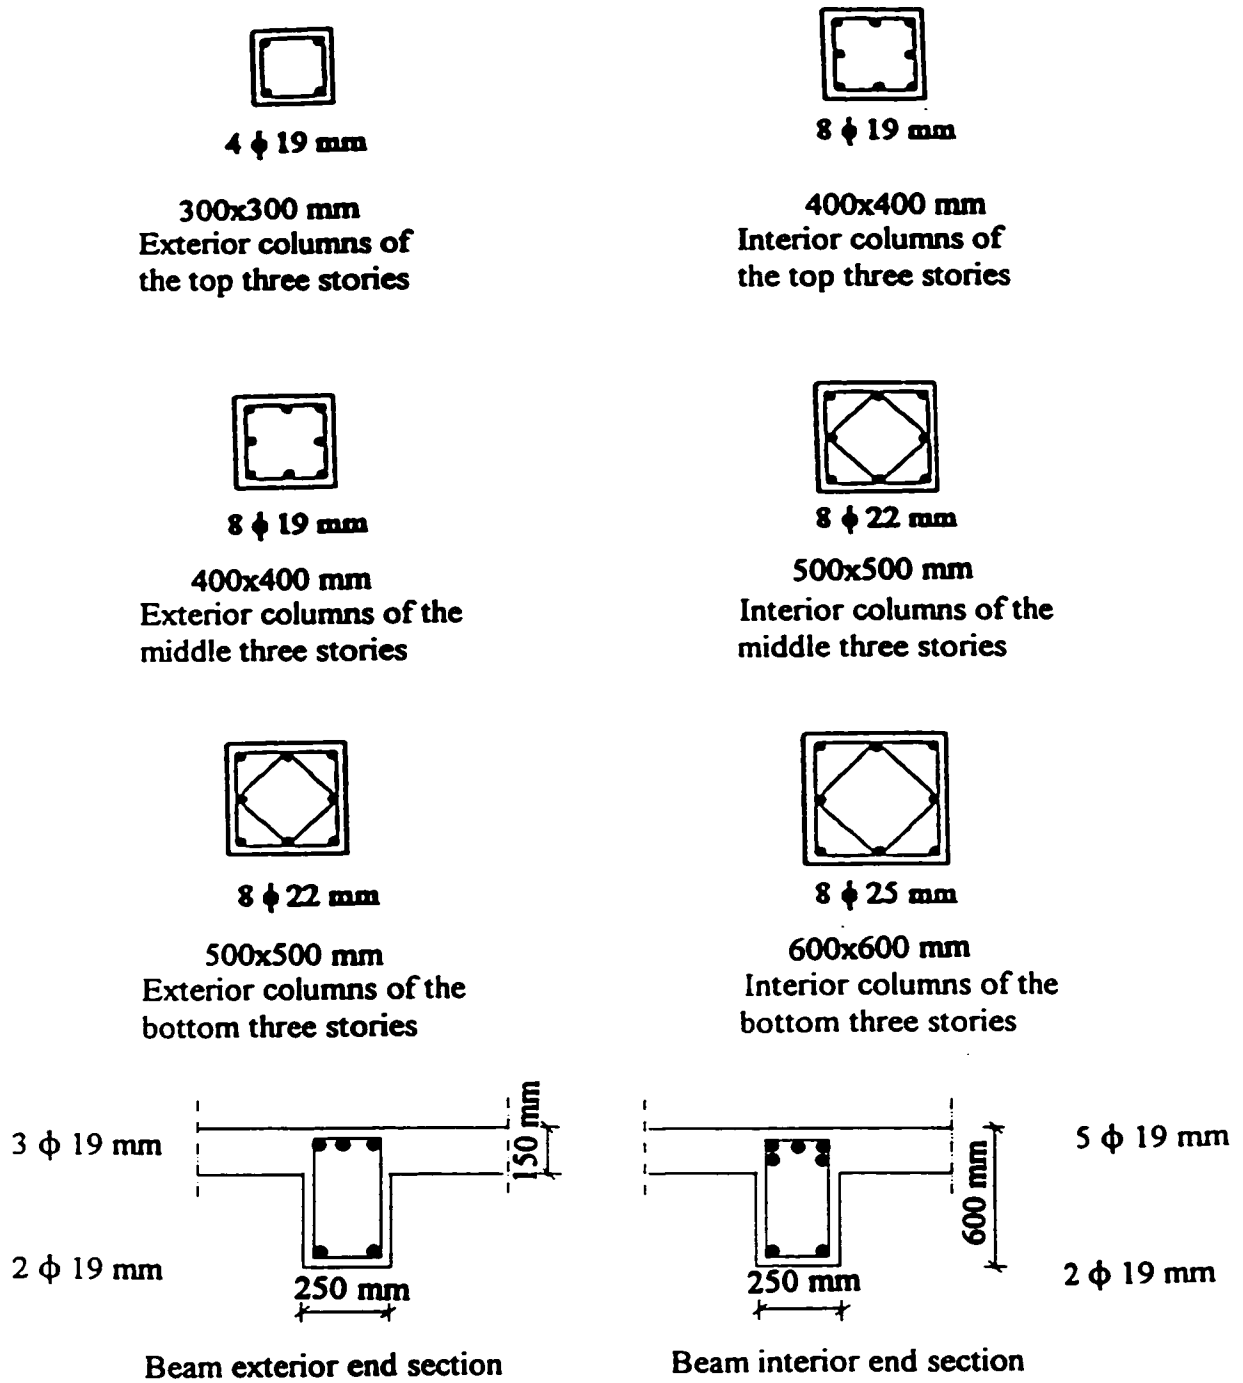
Cross section details of the beams and columns of the nine-story building
